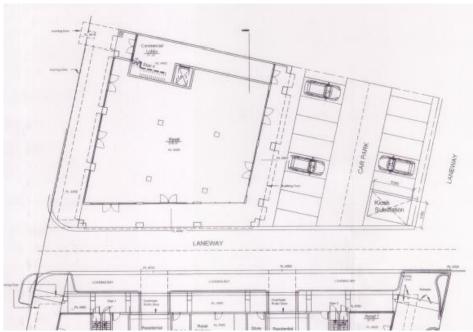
Existing approval of two storey commercial/retail building on 220 Memorial Avenue, comprising 2/3 of the subject site
